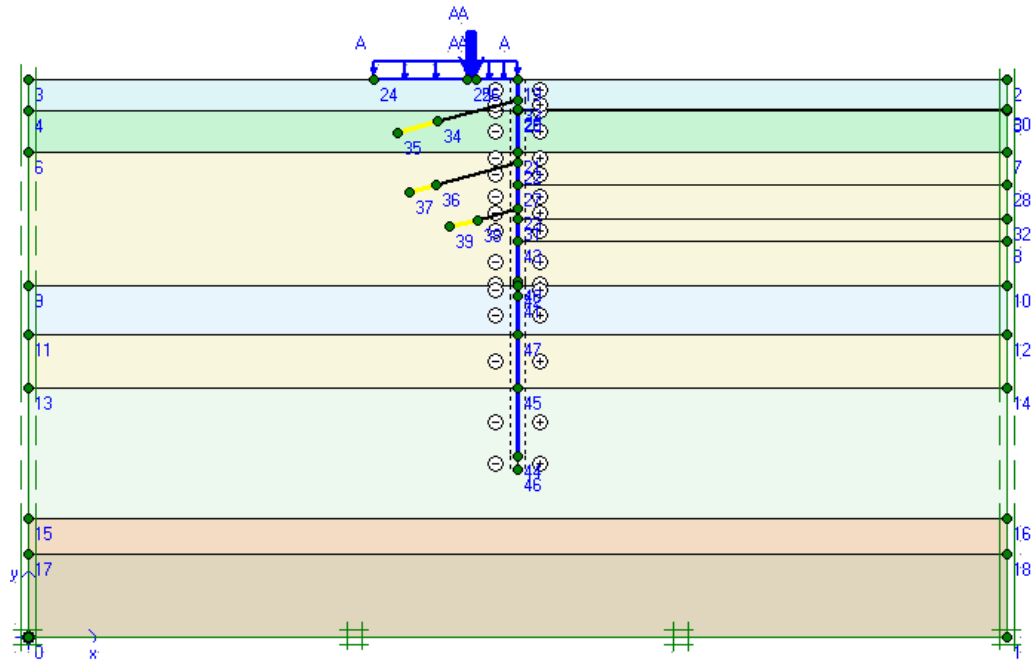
Detailed modelling of the geometry cross-section in PLAXIS
